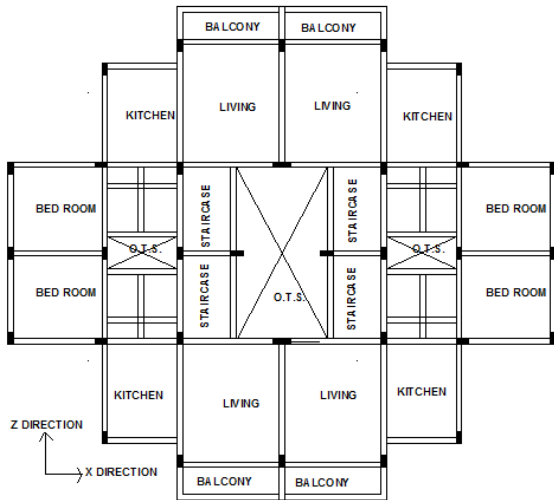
Plan of Building of proposed work (Auto CAD 2008)
